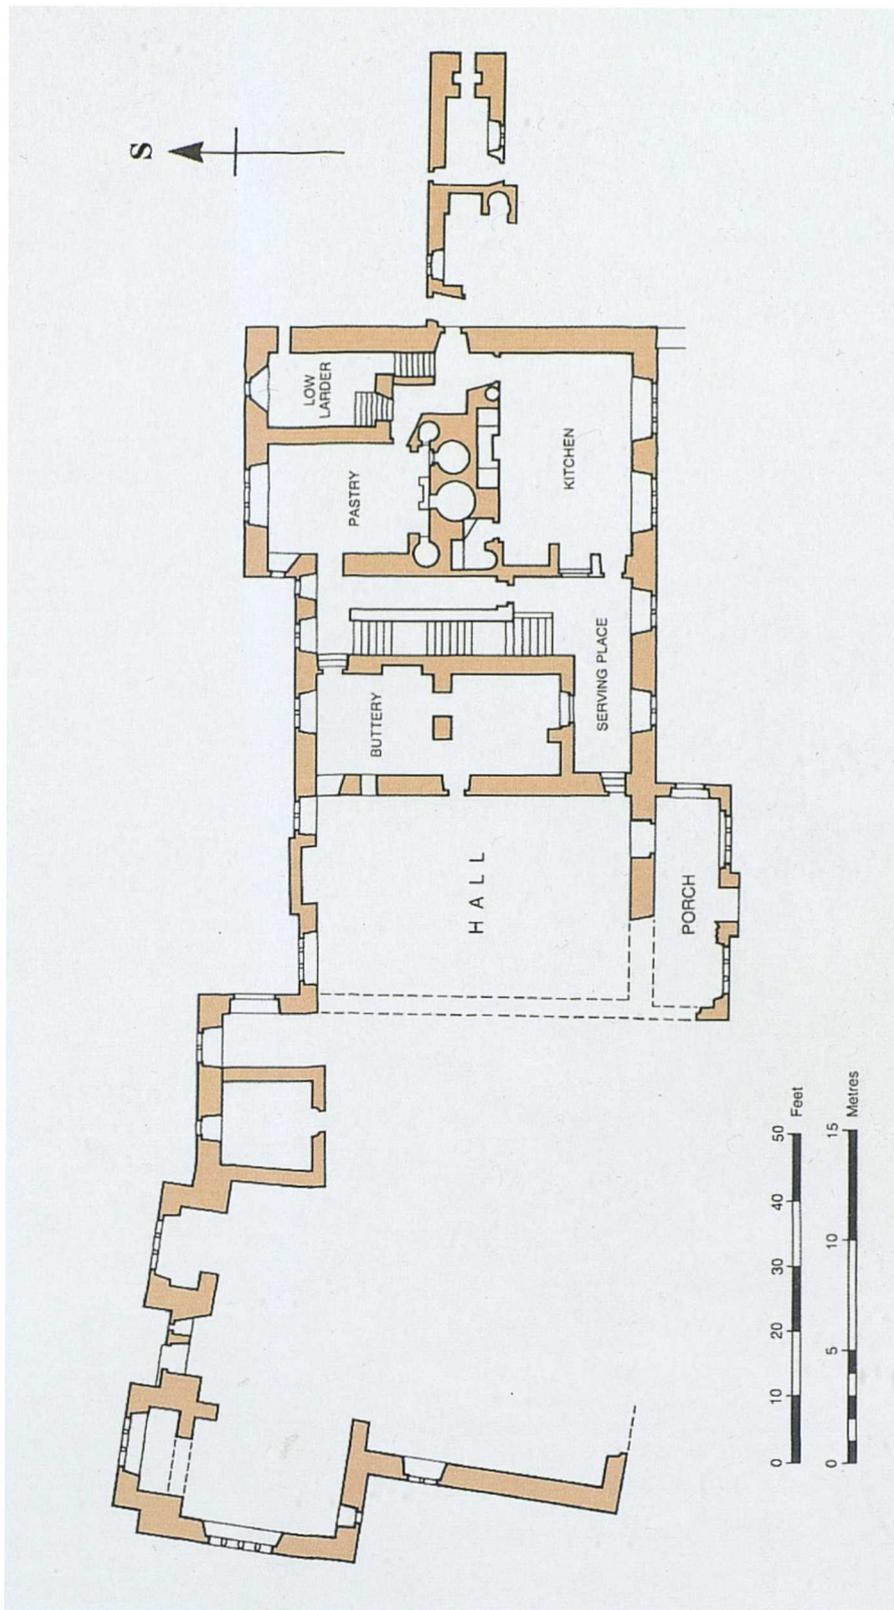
Plan of the surviving ground floor of Hardwick Old Hall.
